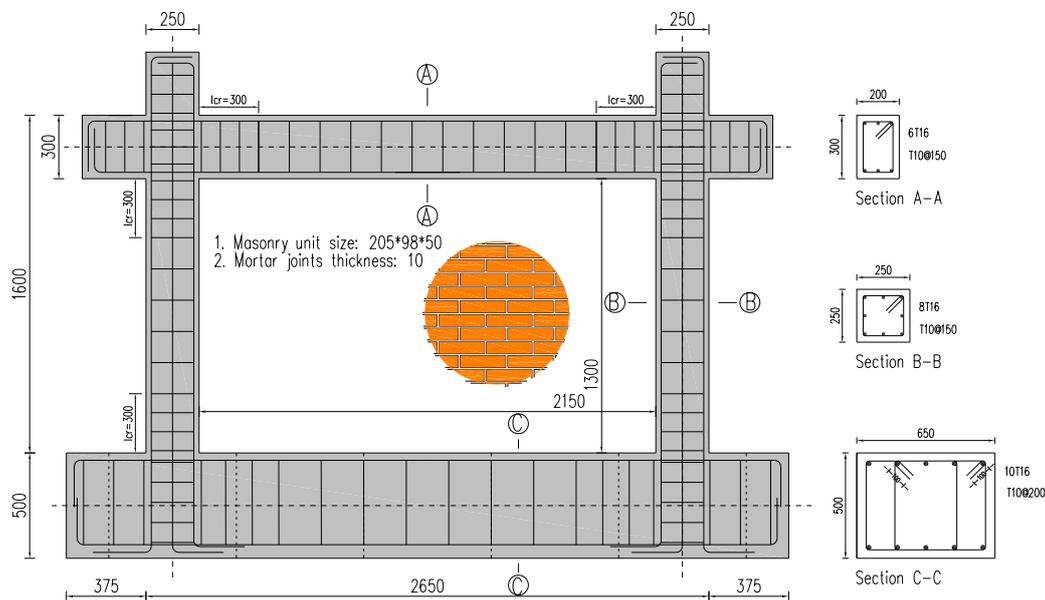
Geometry and reinforcement layout of test specimens (unit: mm)
